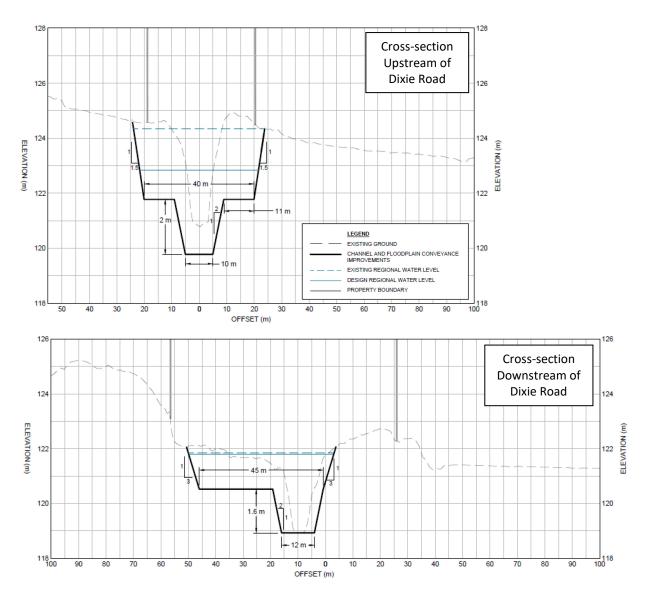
Dixie Area Alternative Solution 2: Typical Cross-sections Upstream and Downstream of Dixie Road
